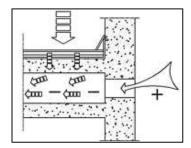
Construction of the roof of two concrete layers- source: (Bader Eddin Elkhouli,
